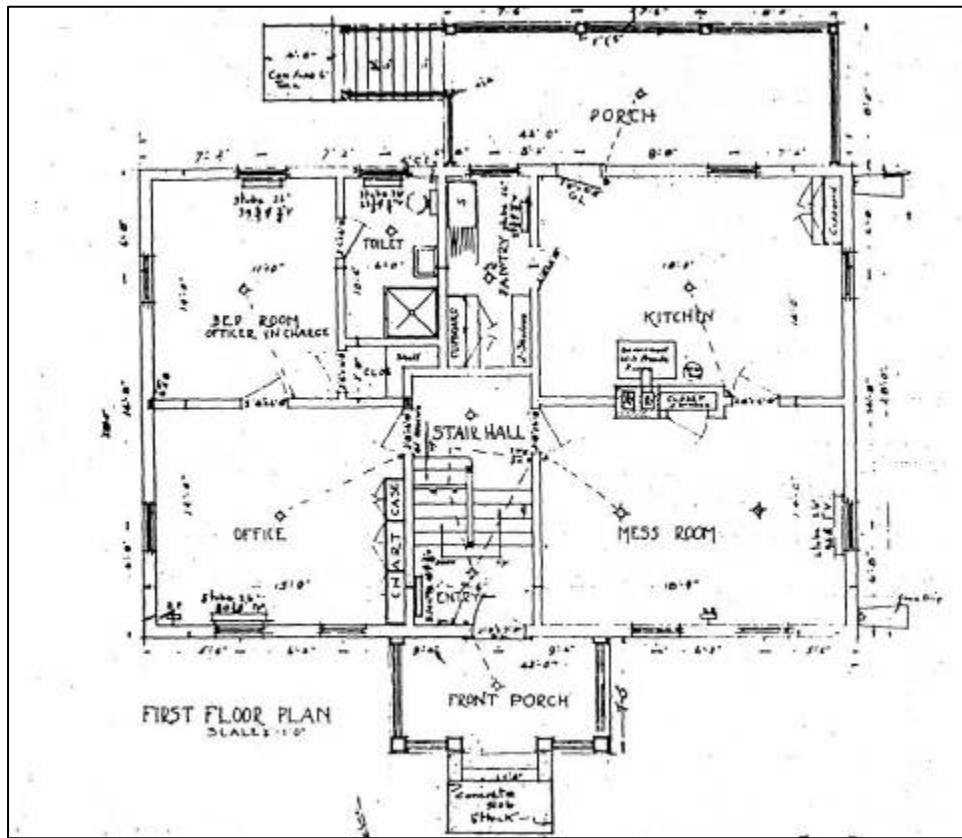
Modified Chatham- type Coast Guard Station at Race Point, Provincetown, MA. Original architectural drawing, 1931, first- floor plan.
